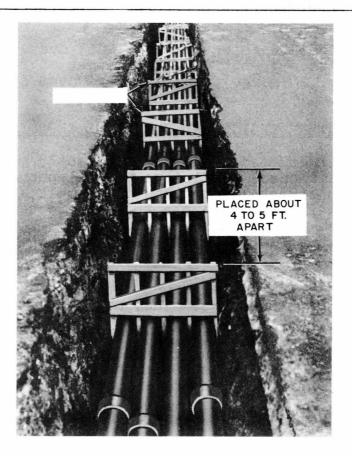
Single Conduits Forming Multiple Duct Structure
